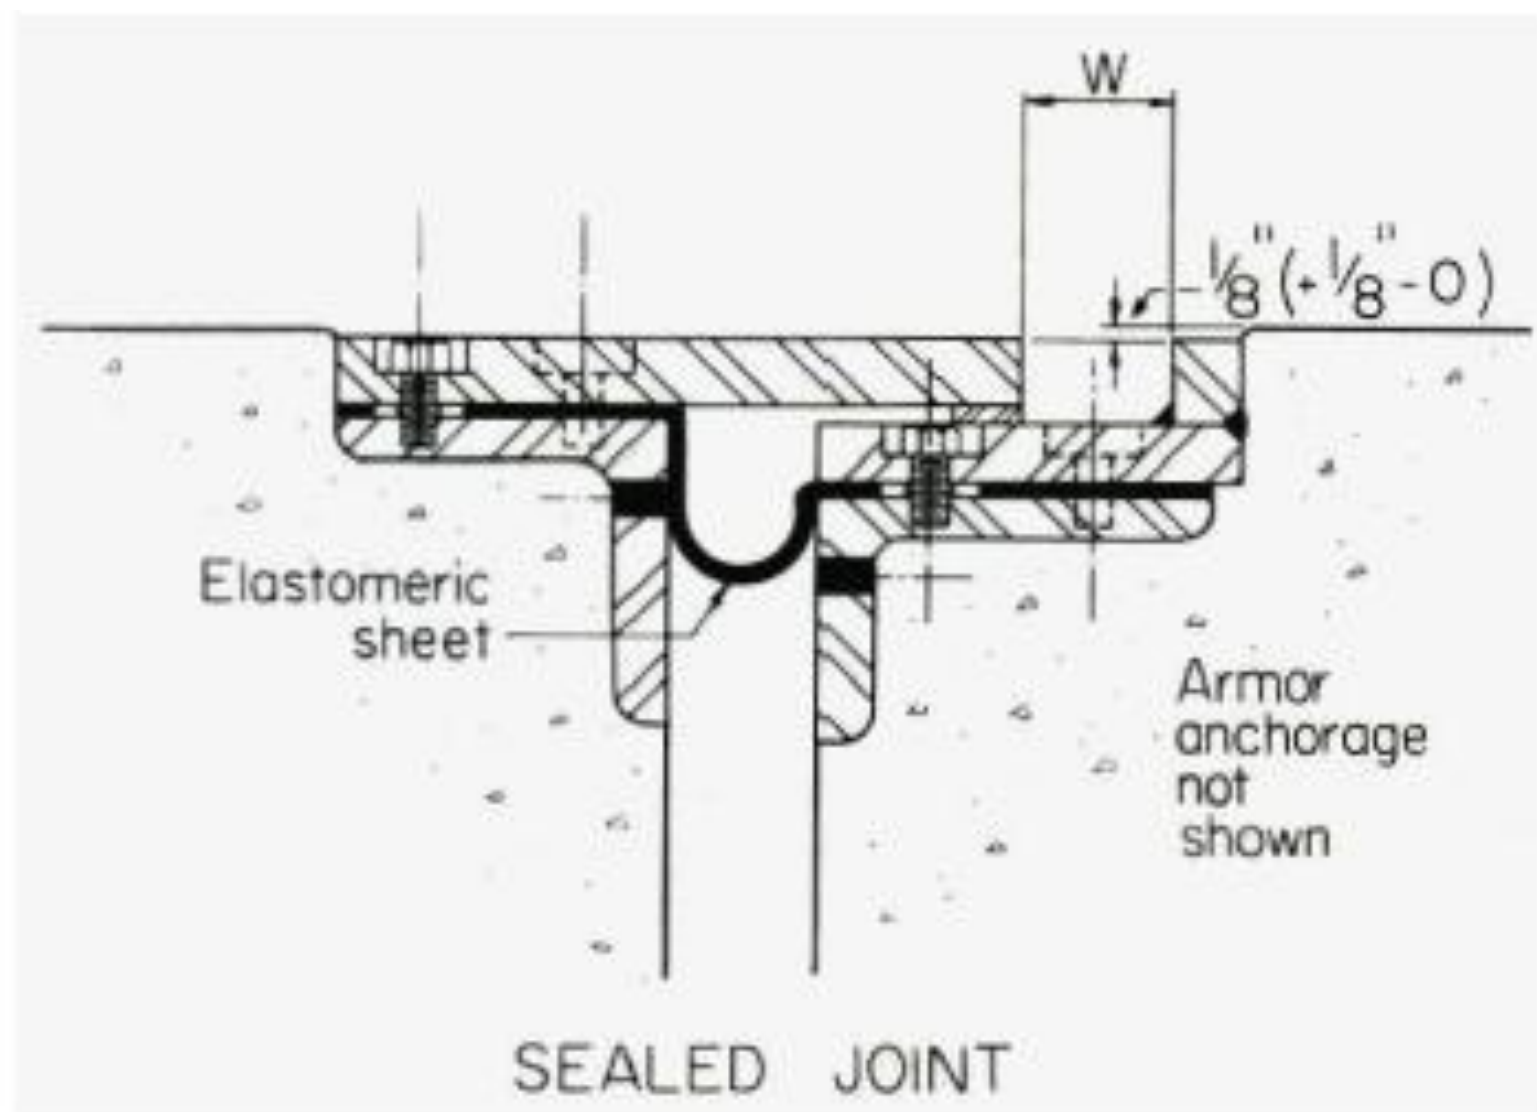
Cross Section of a Sliding Plate Joint
